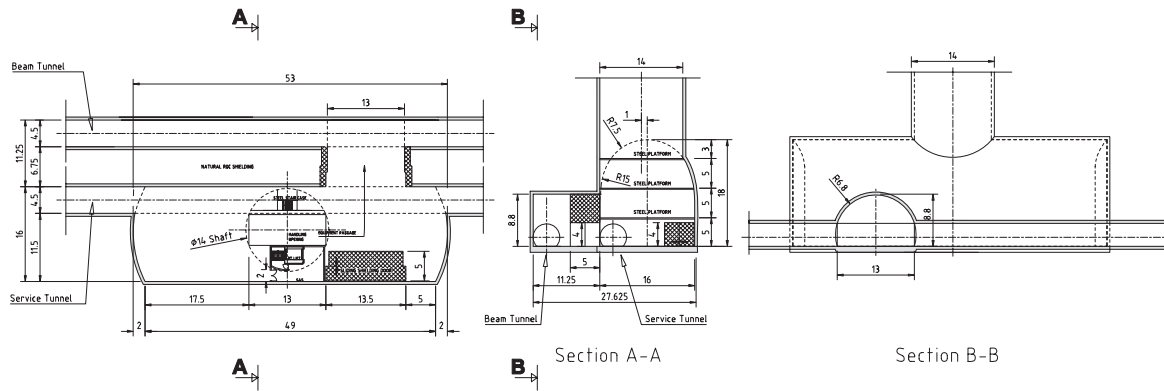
Example of a 9 m shaft with underground cavern, Service and Beam Tunnels (European Sample Site).
